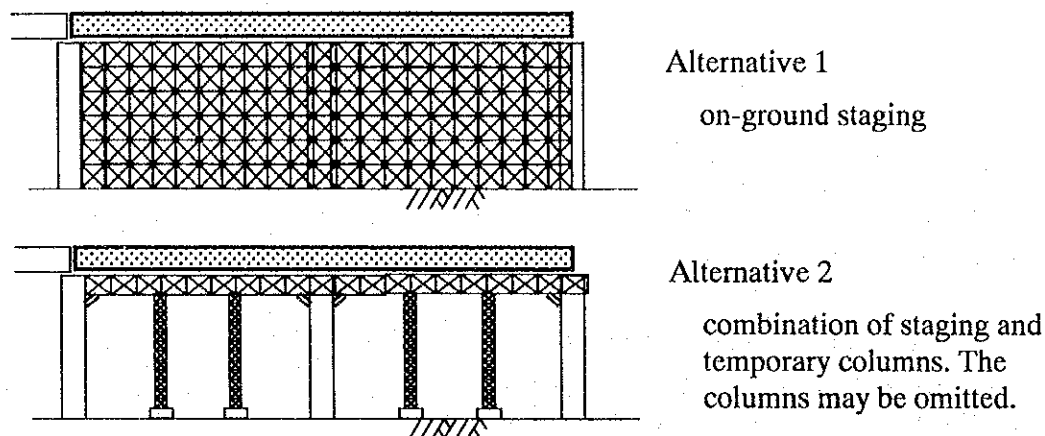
Construction on Fixed Staging (RC hollow slab)
